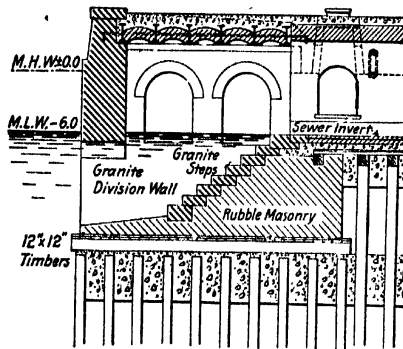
Outlet of Broadway outfall sewer, Borough of the Bronx.
